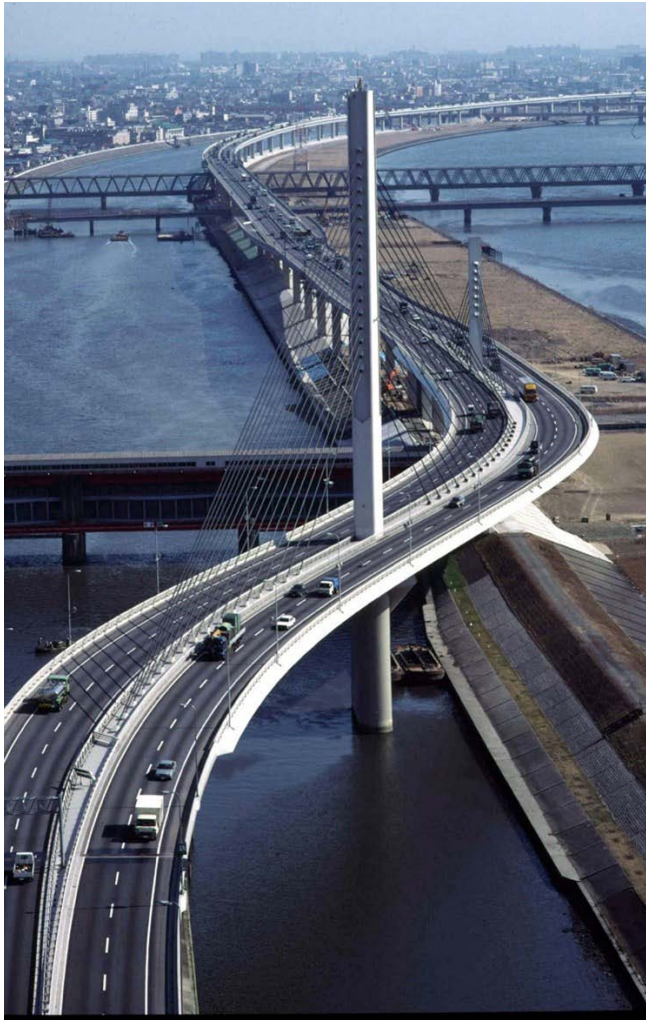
Katsushika Harp Bridge with S-shaped planar alignment.
